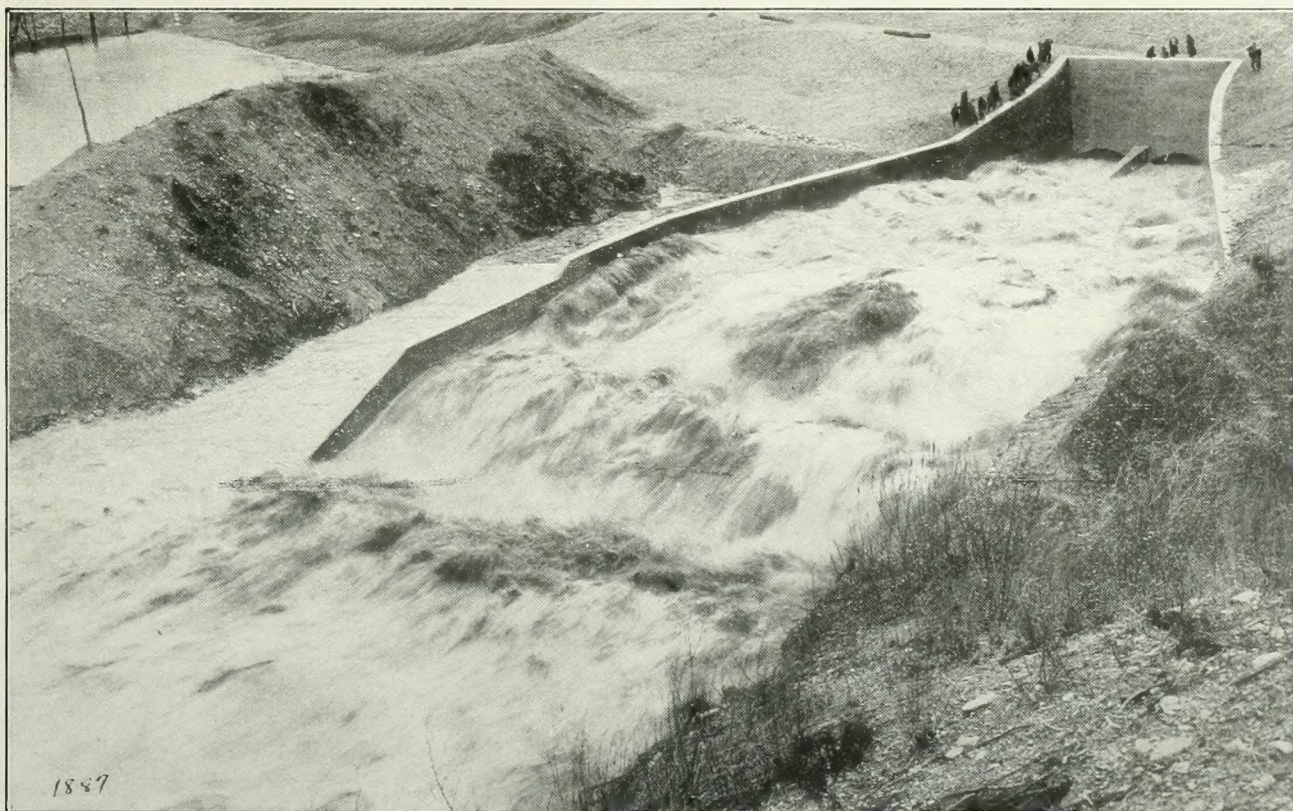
HYDRAULIC JUMP AT GERMANTOWN DAM OUTLET, APRIL 20, 1920.
